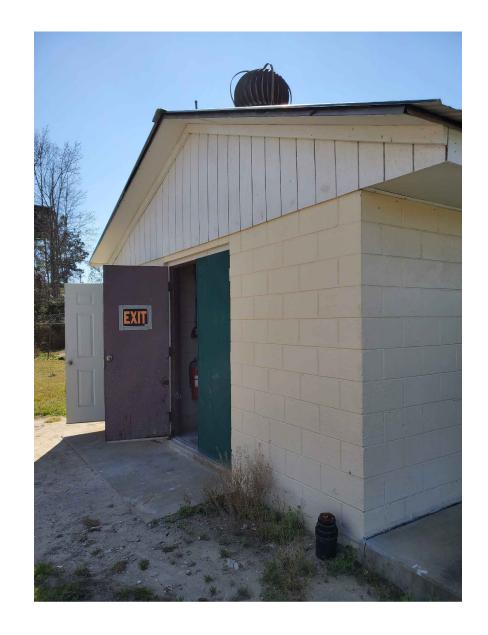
LOOKING SOUTH TOWARD WELL BUILDING
